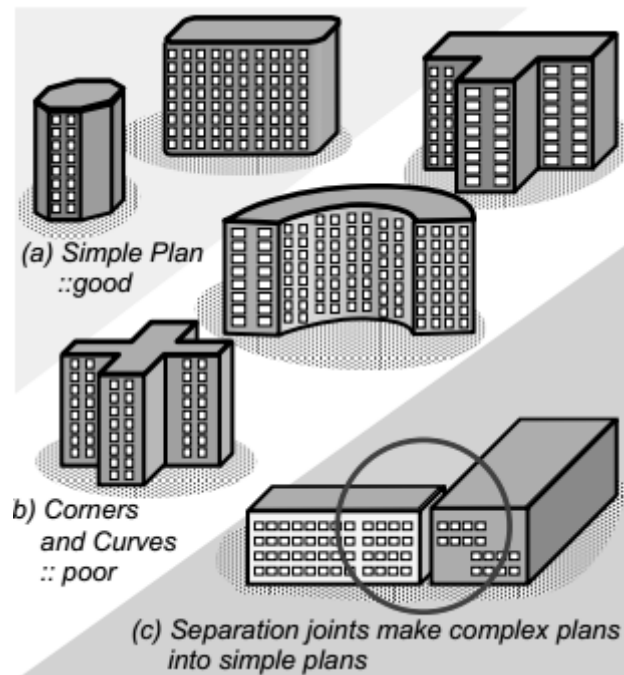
Building with simple plan perform well during earthquakes [45]
